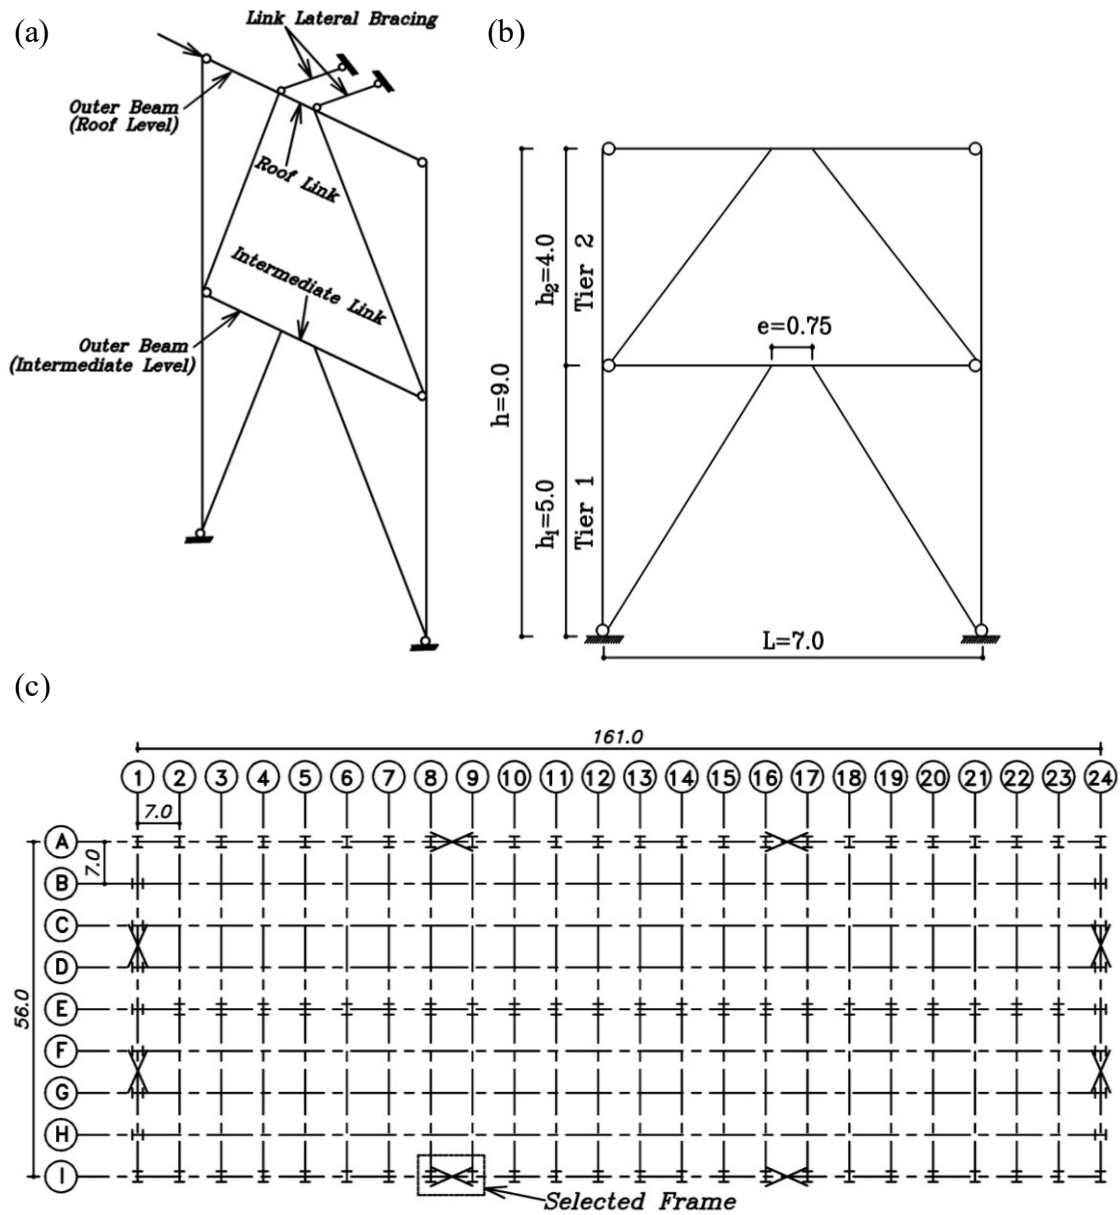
(a) Two-tiered eccentrically braced frame; (b) Frame geometry; (c) Building plan view (dimensions in m).
